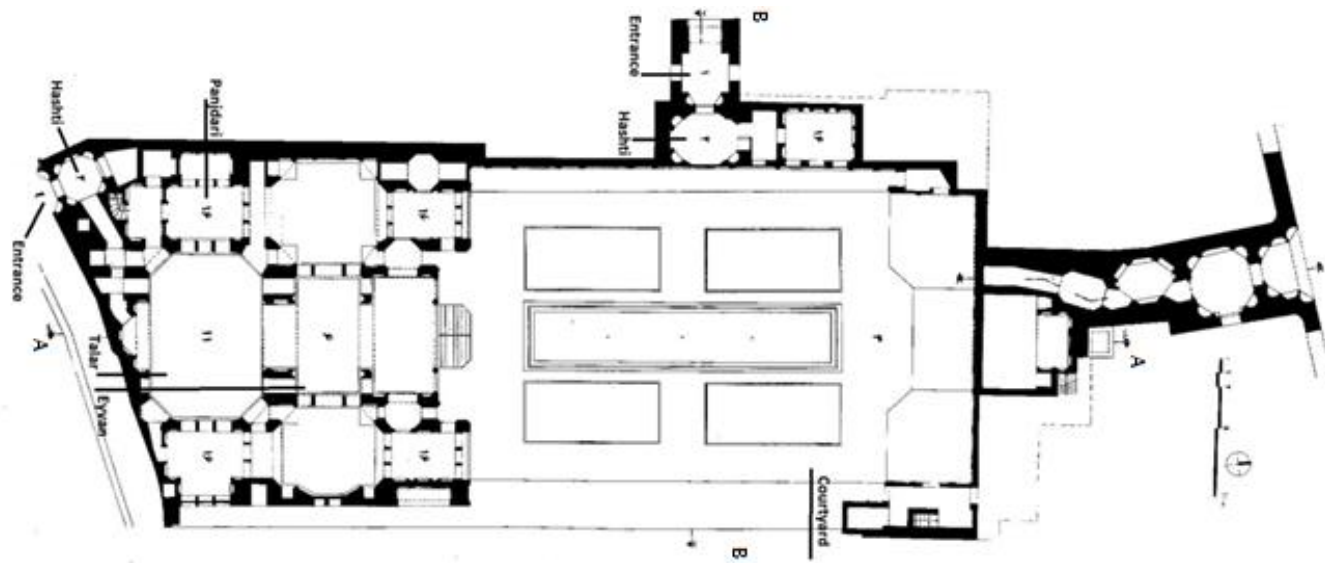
Broujerdi House (First floor) Kashan (URL 18)
